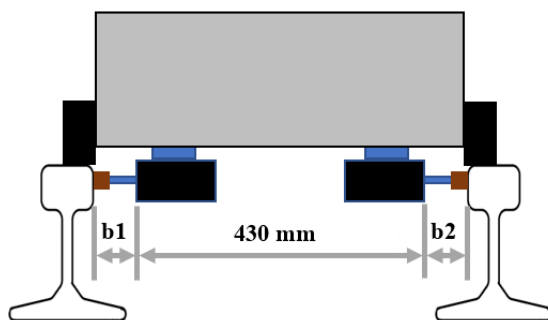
Measurement Method for Gauge of the Railway Geometry Inspection Vehicle.
